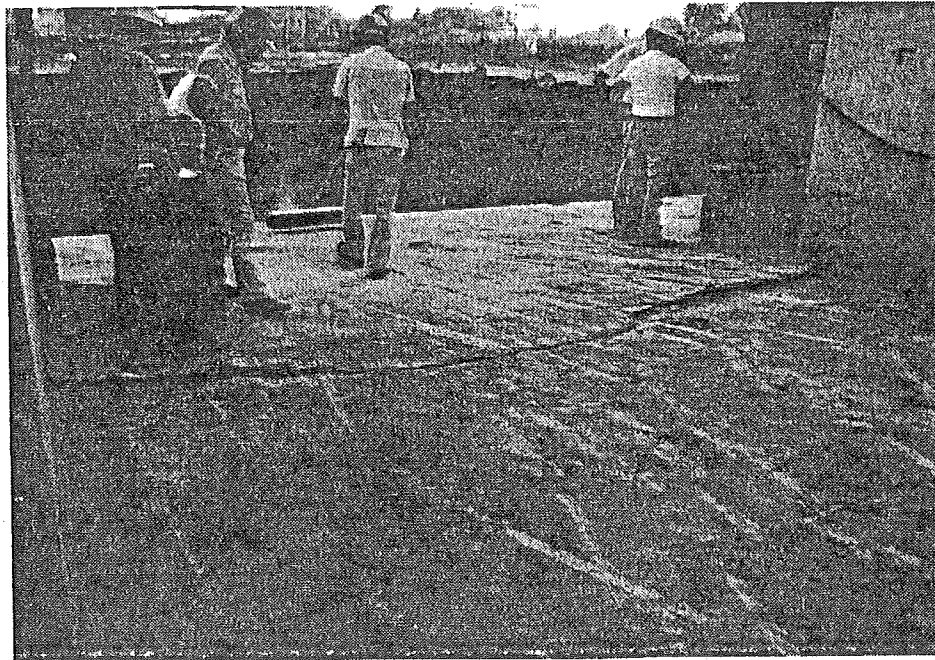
Crack between Pier 11N columns -- looking north toward the river.
